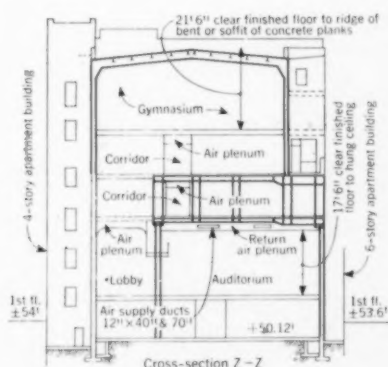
Air ducts were more easily placed when Viereendeel trusses were used. Verticality of truss members also influenced choice of this type of truss.
